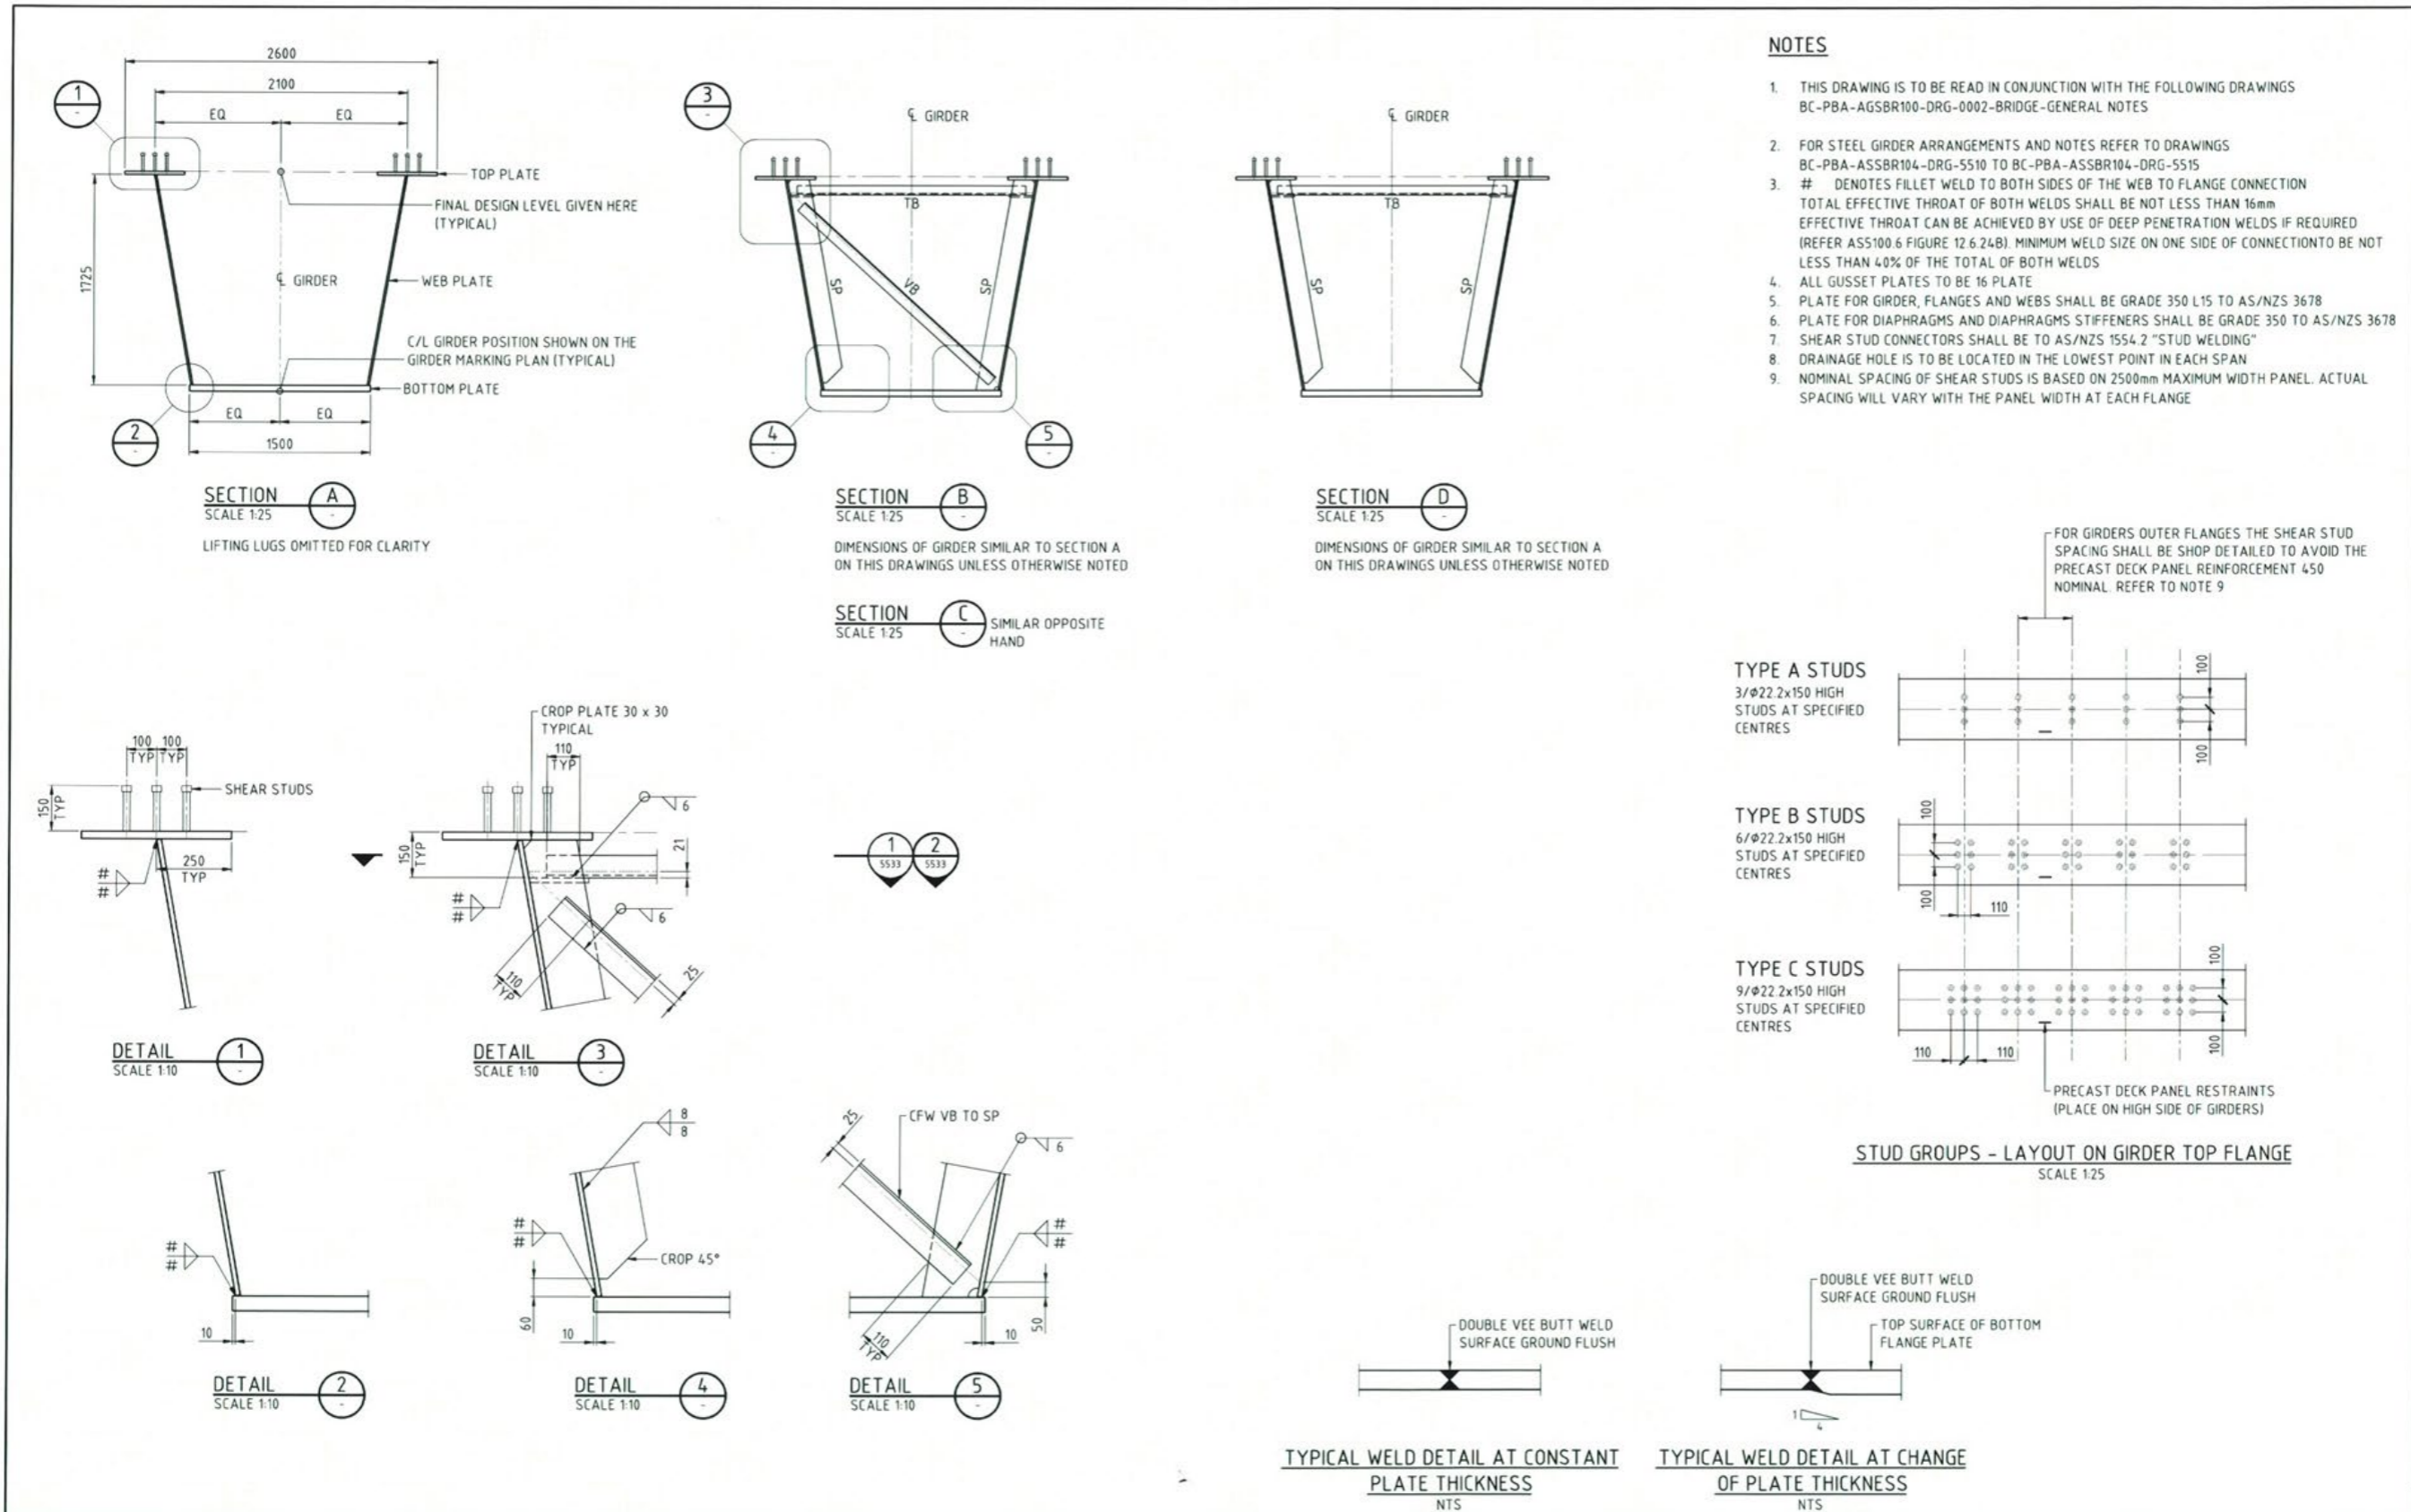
(c) - Example steel box girder bridge drawings - steel girder details - Sheet 1
